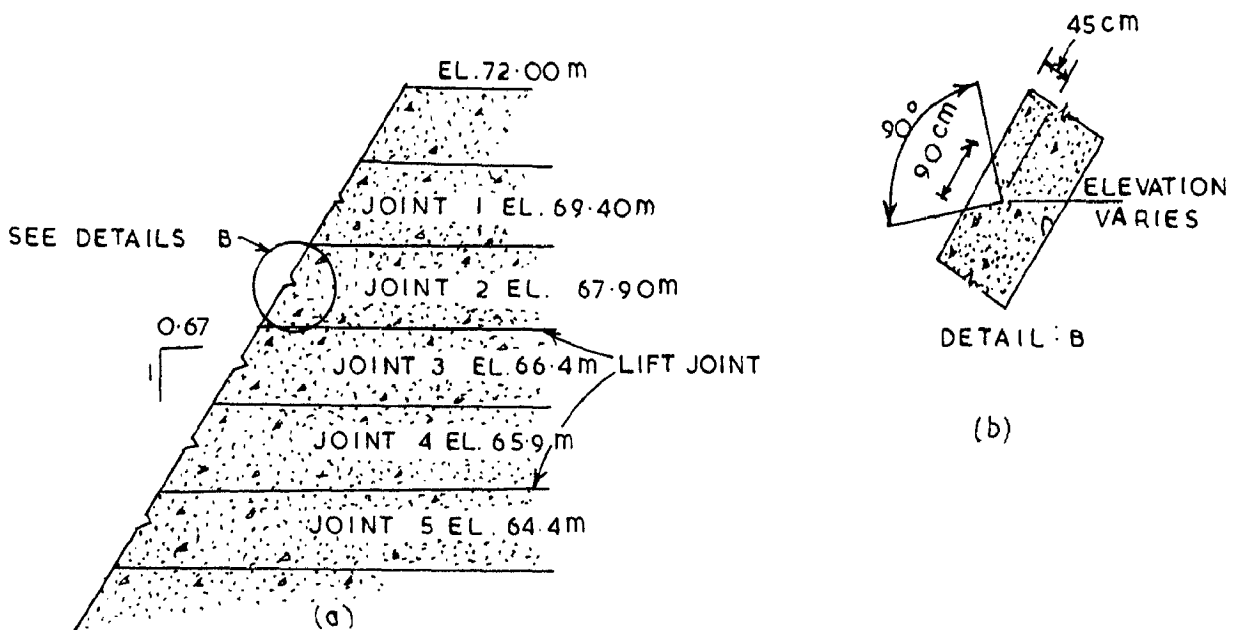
DETAILS OF V. JOINTS ON SPILLWAY FACE OF CLARK HILL DAM
